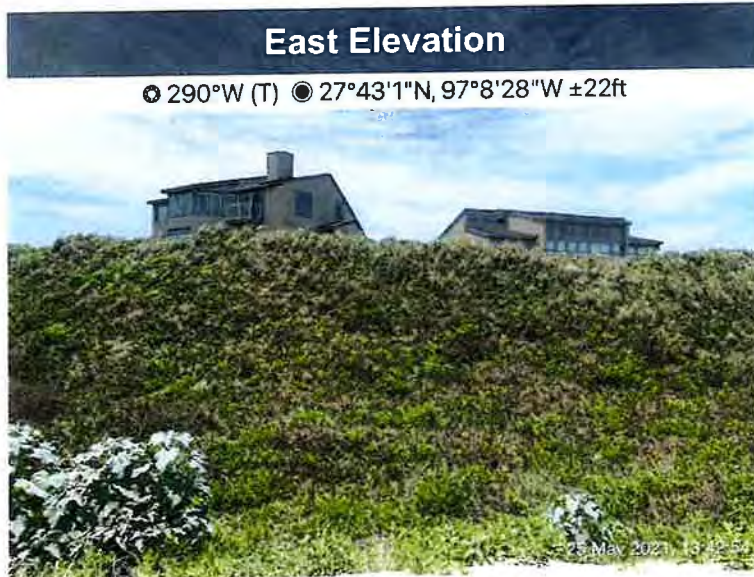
ADMIRAL'S ROW, FACING WEST
